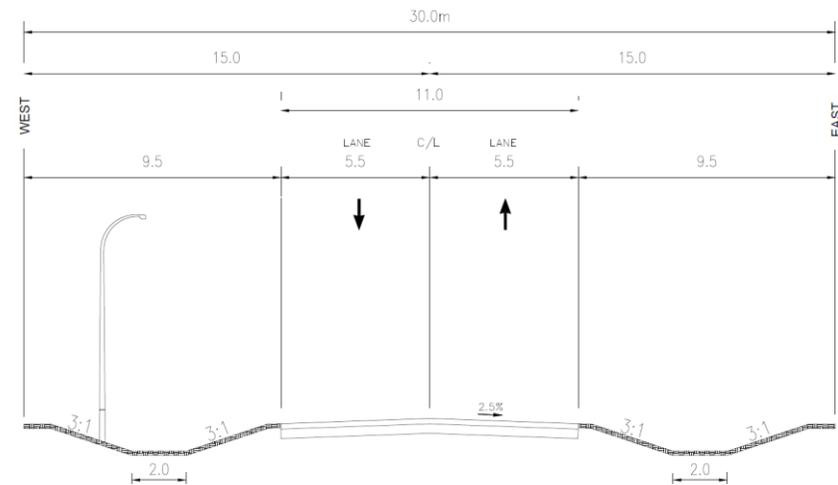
South West Boundary Road Proposed Cross-Section
